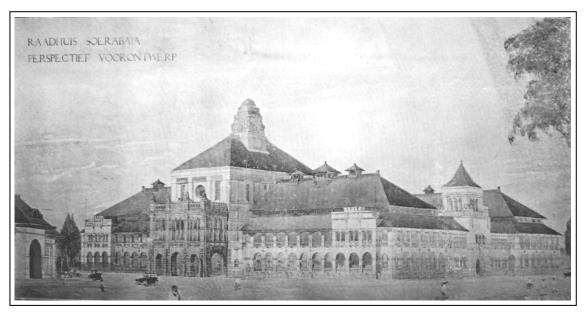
Town Hall in the Town Park: perspective drawing.
